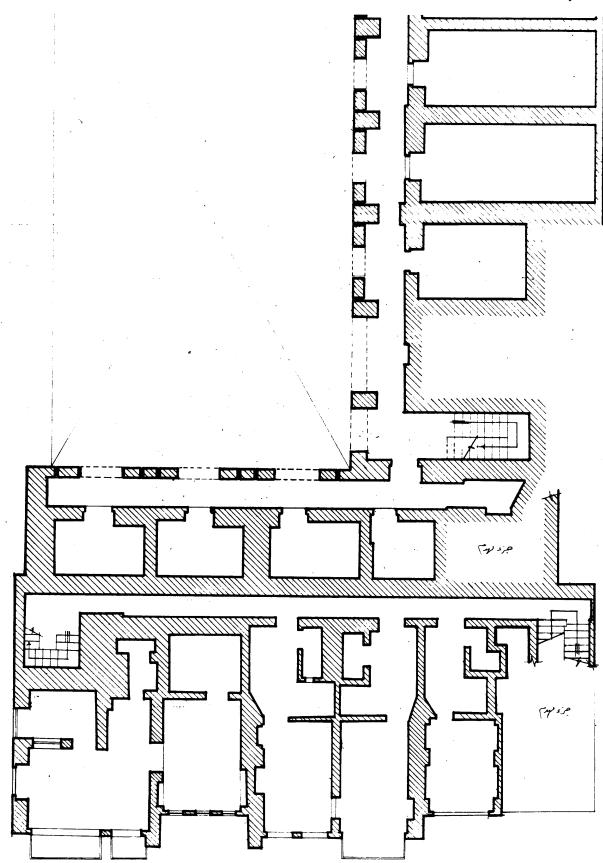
Khān al-Zarākisha. First floor plan. (Antiquities)
